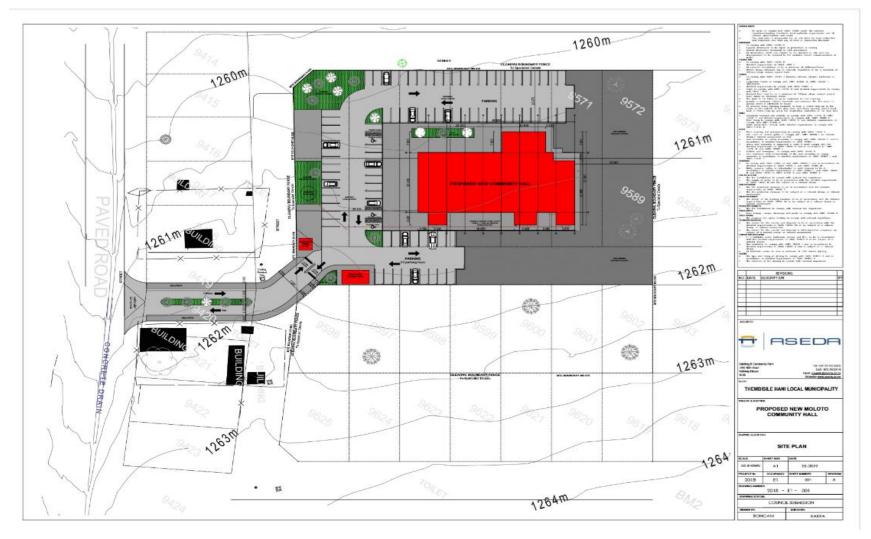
Layout (Site) Plan of the Moloto Community Hall (Source: ASEDA, 2019)
